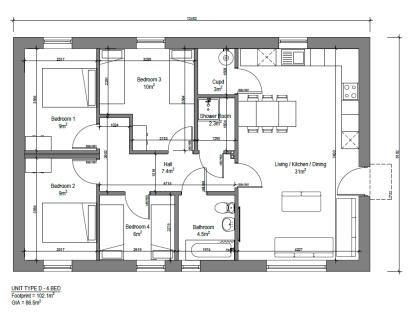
Approved Plan – Unit Type D-A General Arrangement Plan (affected plots 13, 15, 17 and 27)
